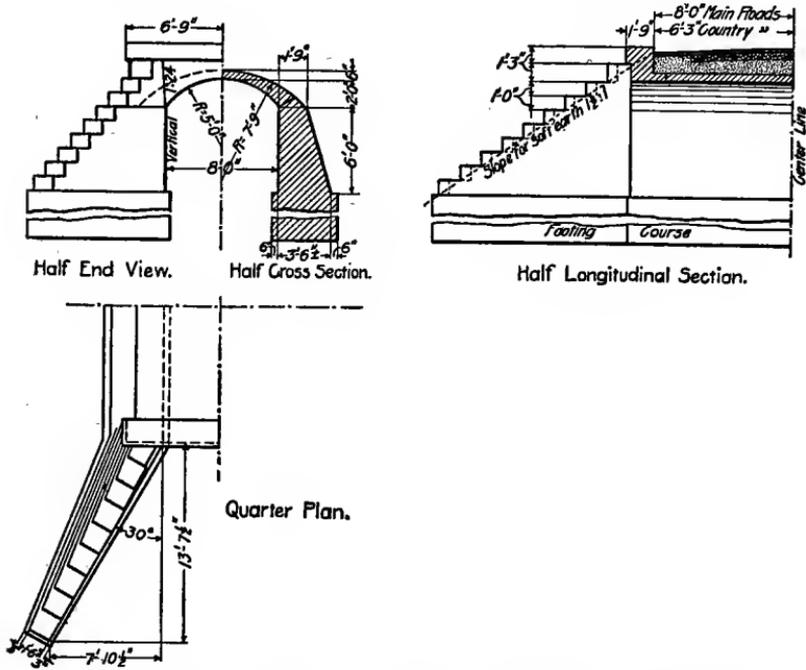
PLAIN CONCRETE HIGHWAY ARCH CULVERT, PORTO RICO.
